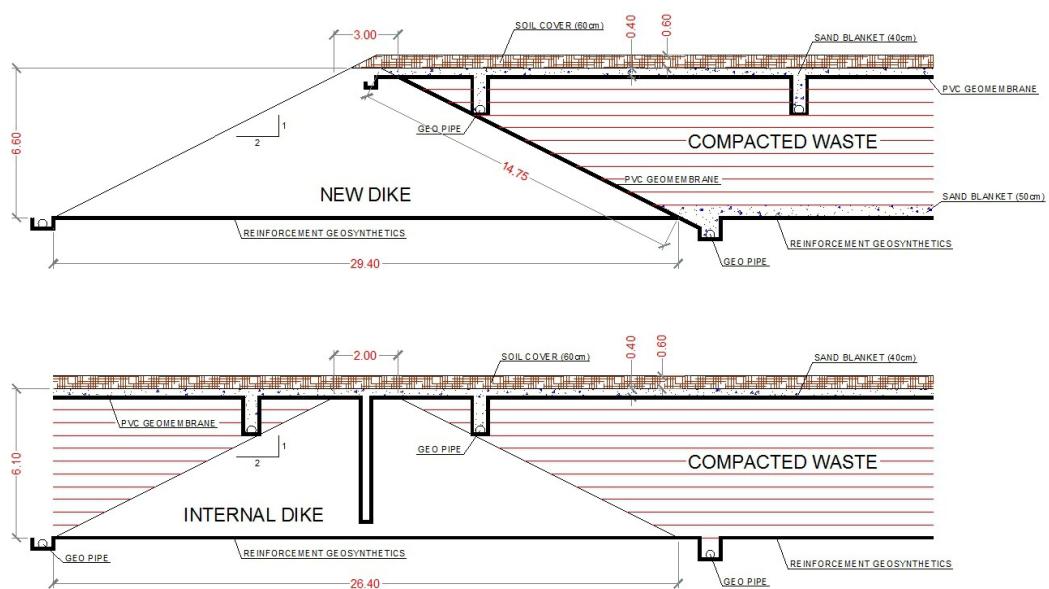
Proposed design for the new waste disposal facility – (a) external dike section, (b) internal division dike section
